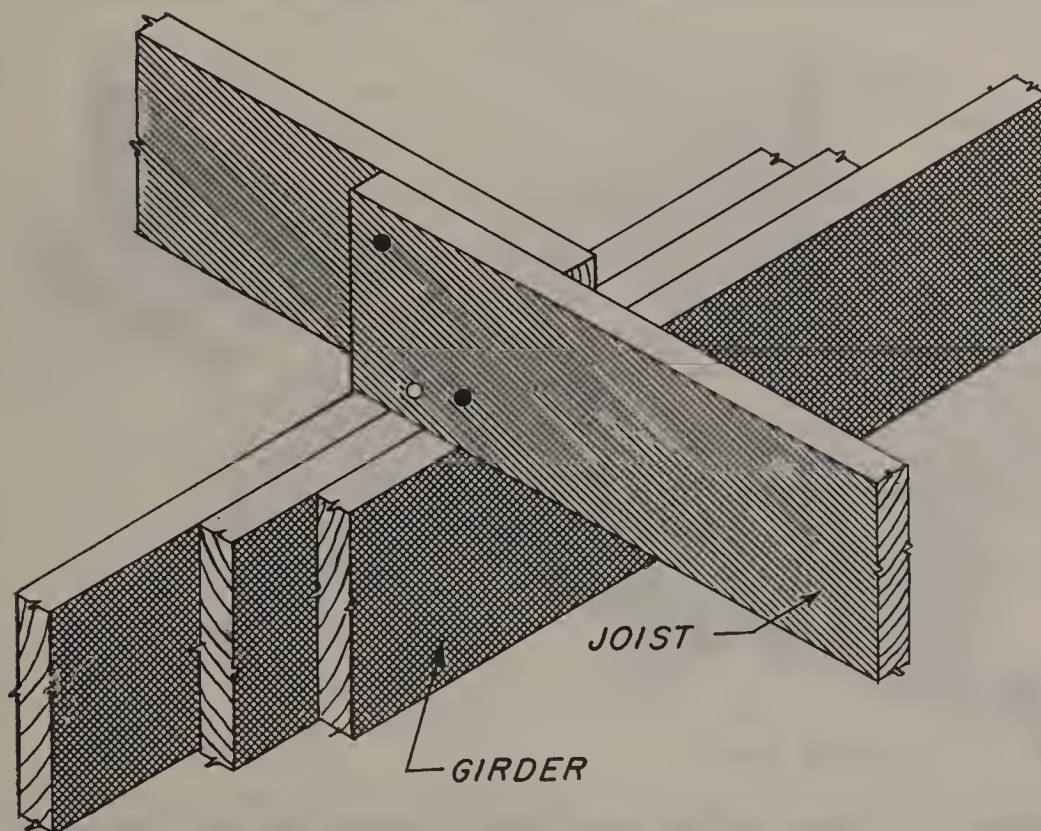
Joist bearing on girder (or partition) Joists nailed together with two tenpenny nails and toenailed to girder with one tenpenny nail on each side of the pair of joists.
